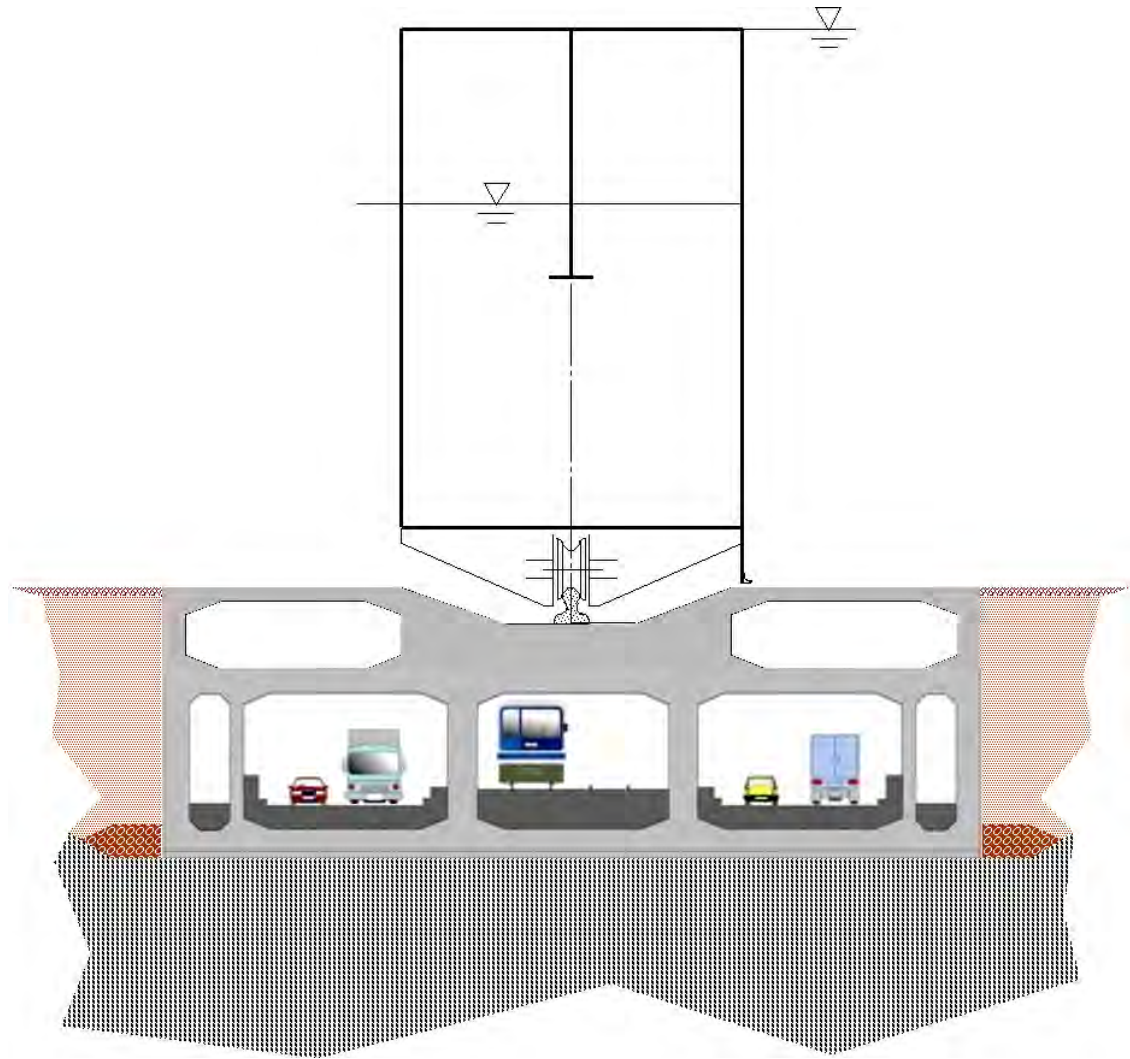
Image of submerged tunnel type concrete foundation structure.
